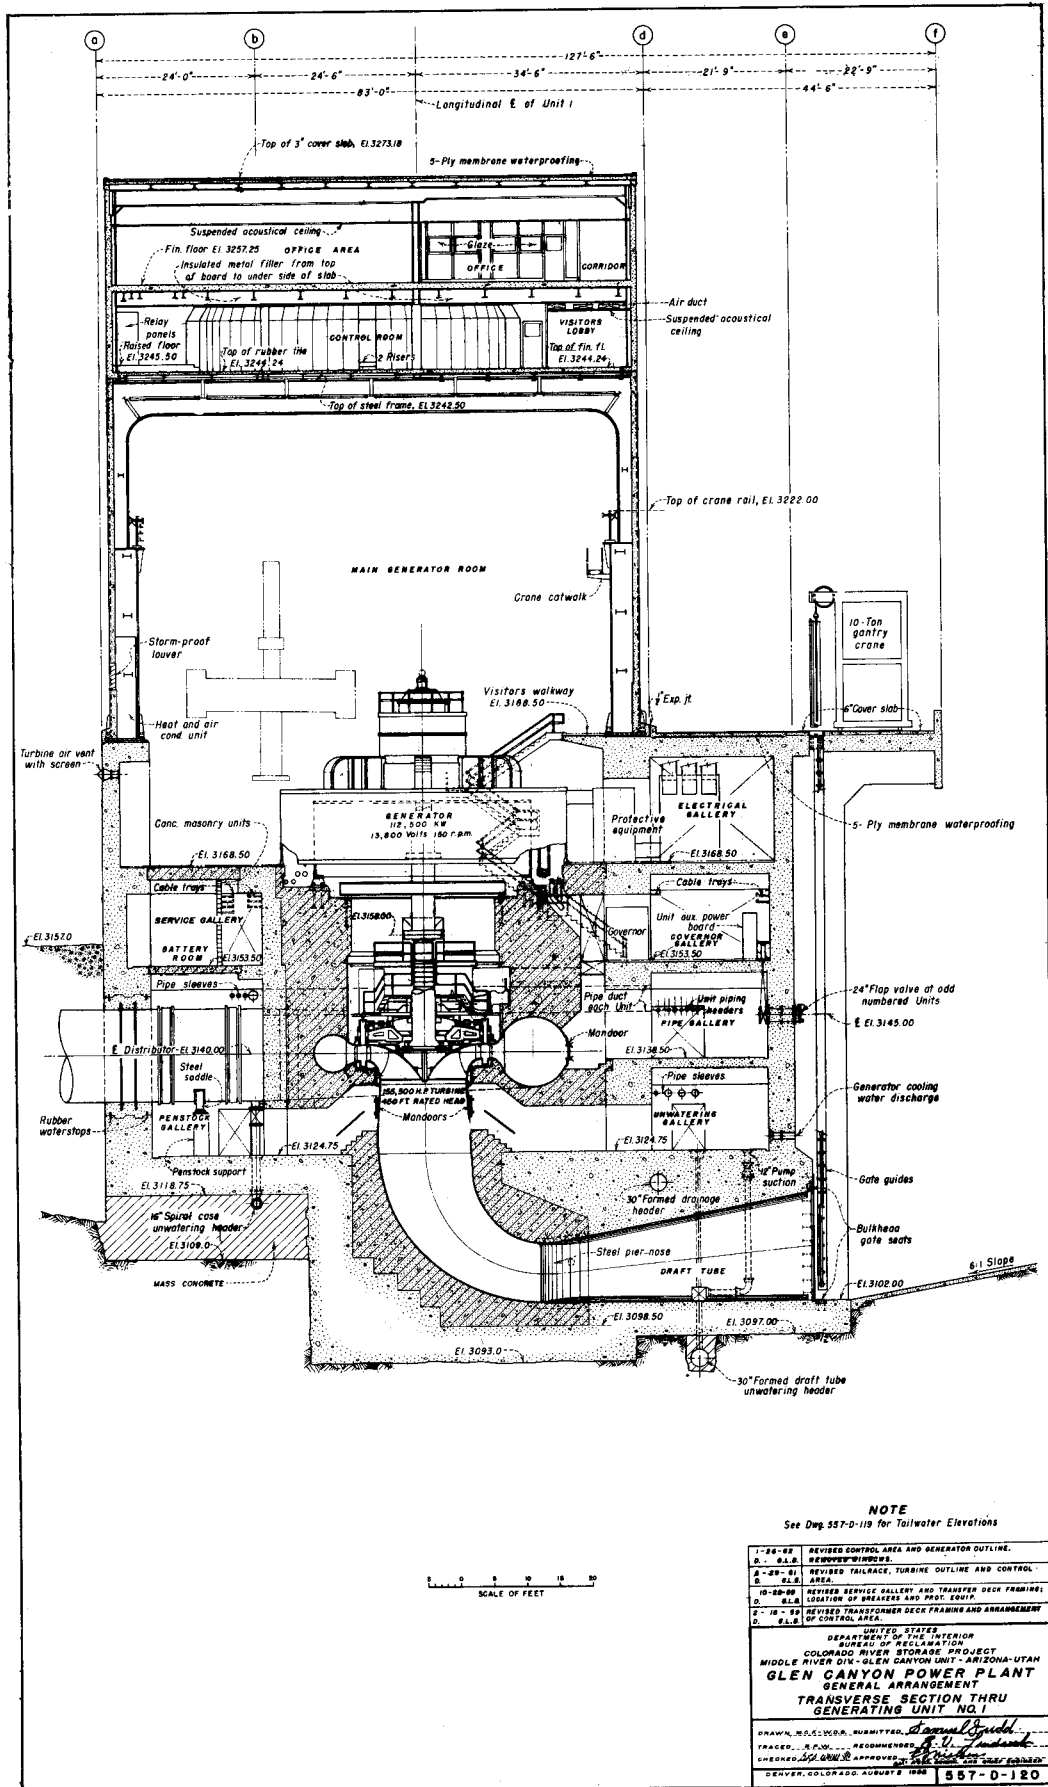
Powerplant general arrangement—Transverse section through generating unit 1.
